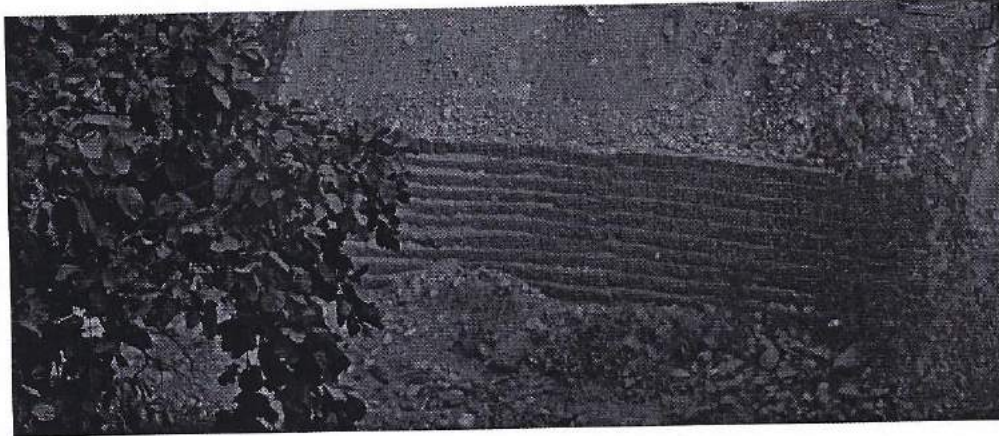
Close view of erected Gabion wall surrounding the periphery of muck disposal site
